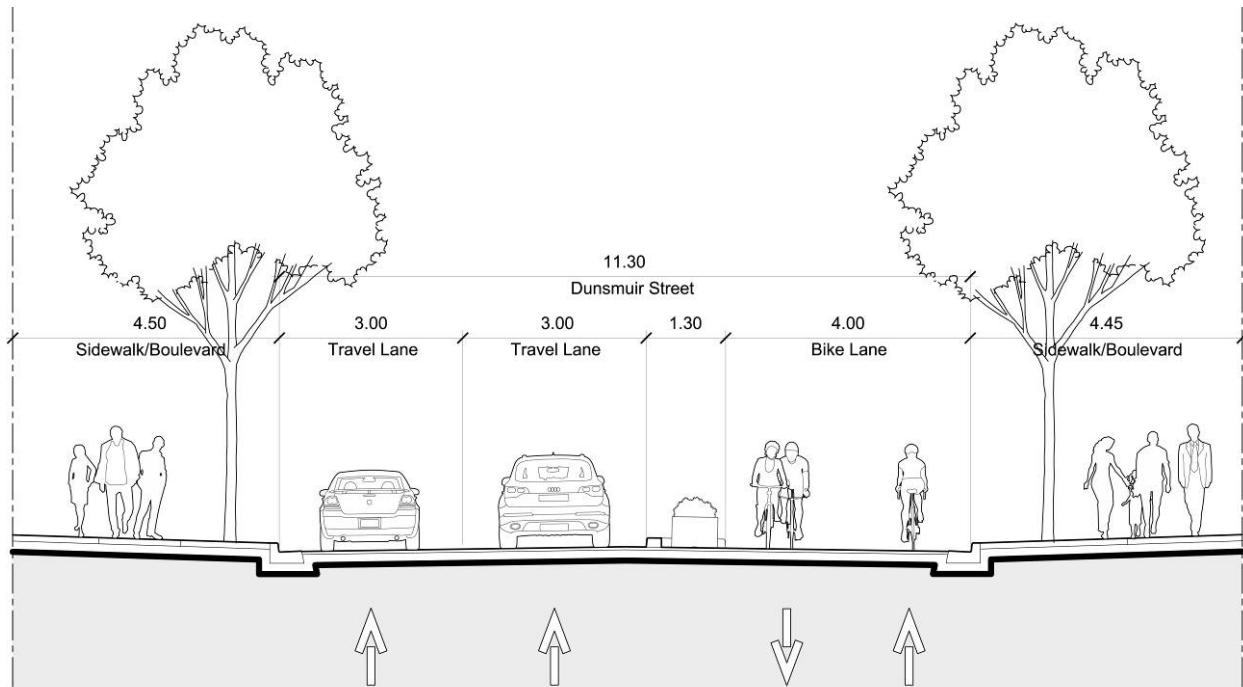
Proposed cross-section of Dunsmuir Street between Richards and Hornby Streets (looking west)
